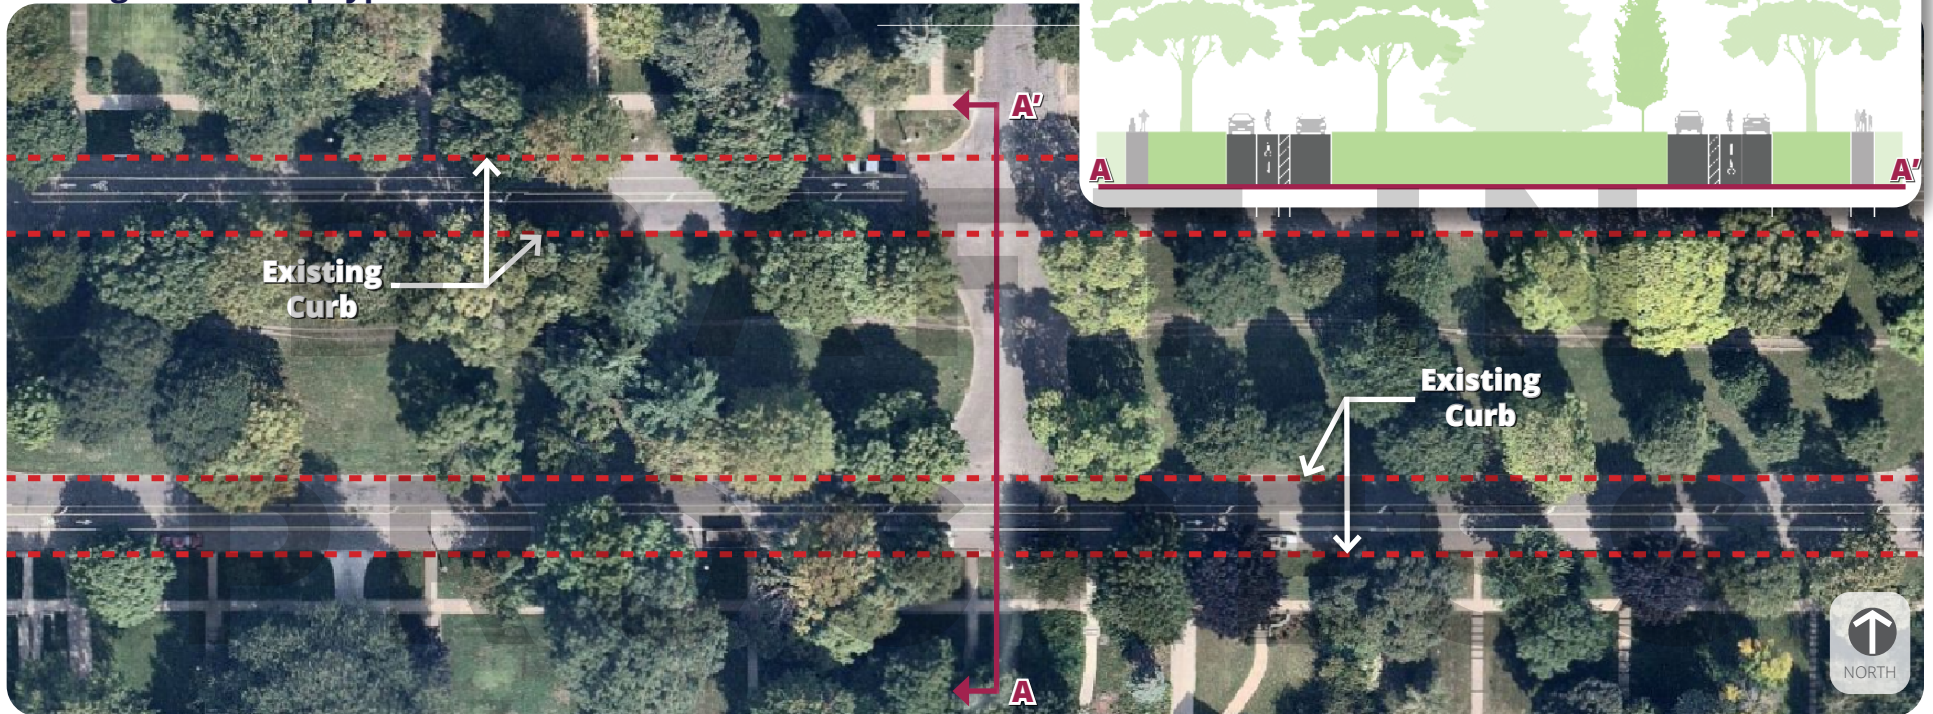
| Segments A and C - Existing Condition - Typical Block
